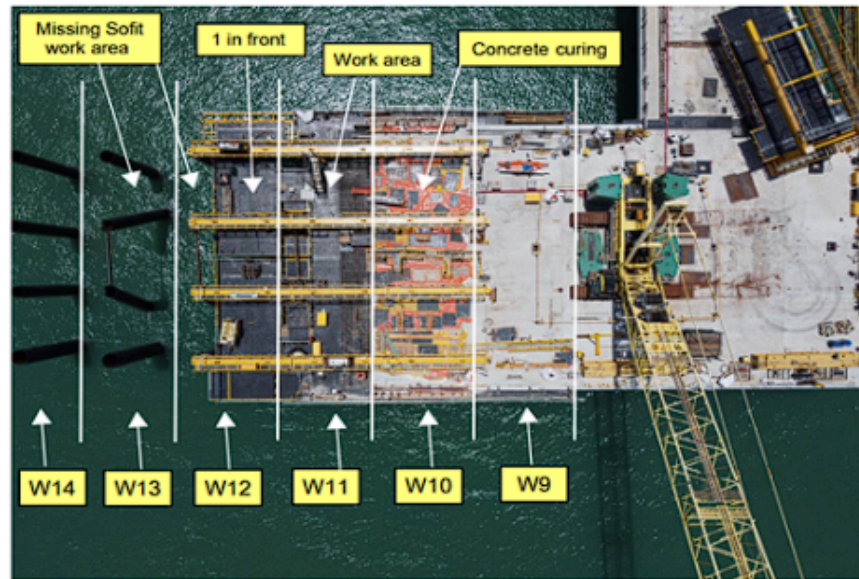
Drone photo – W11 work area, evidence of the missing W13 and W14 Soffits
